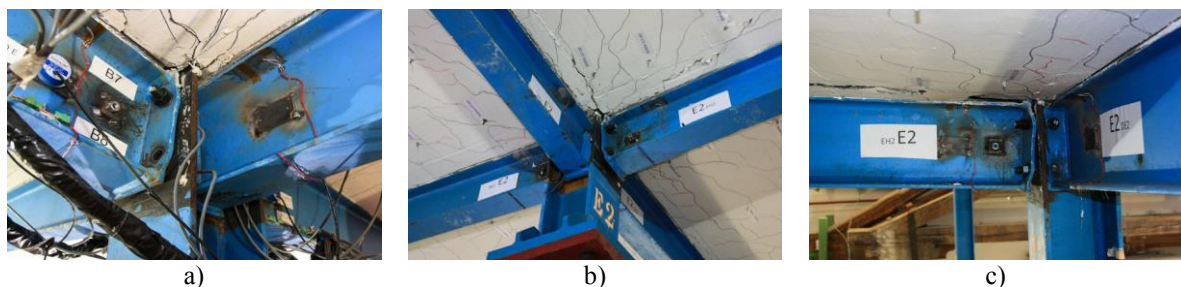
Deformation at column's collapse: the central joint (Asymmetric configuration)
